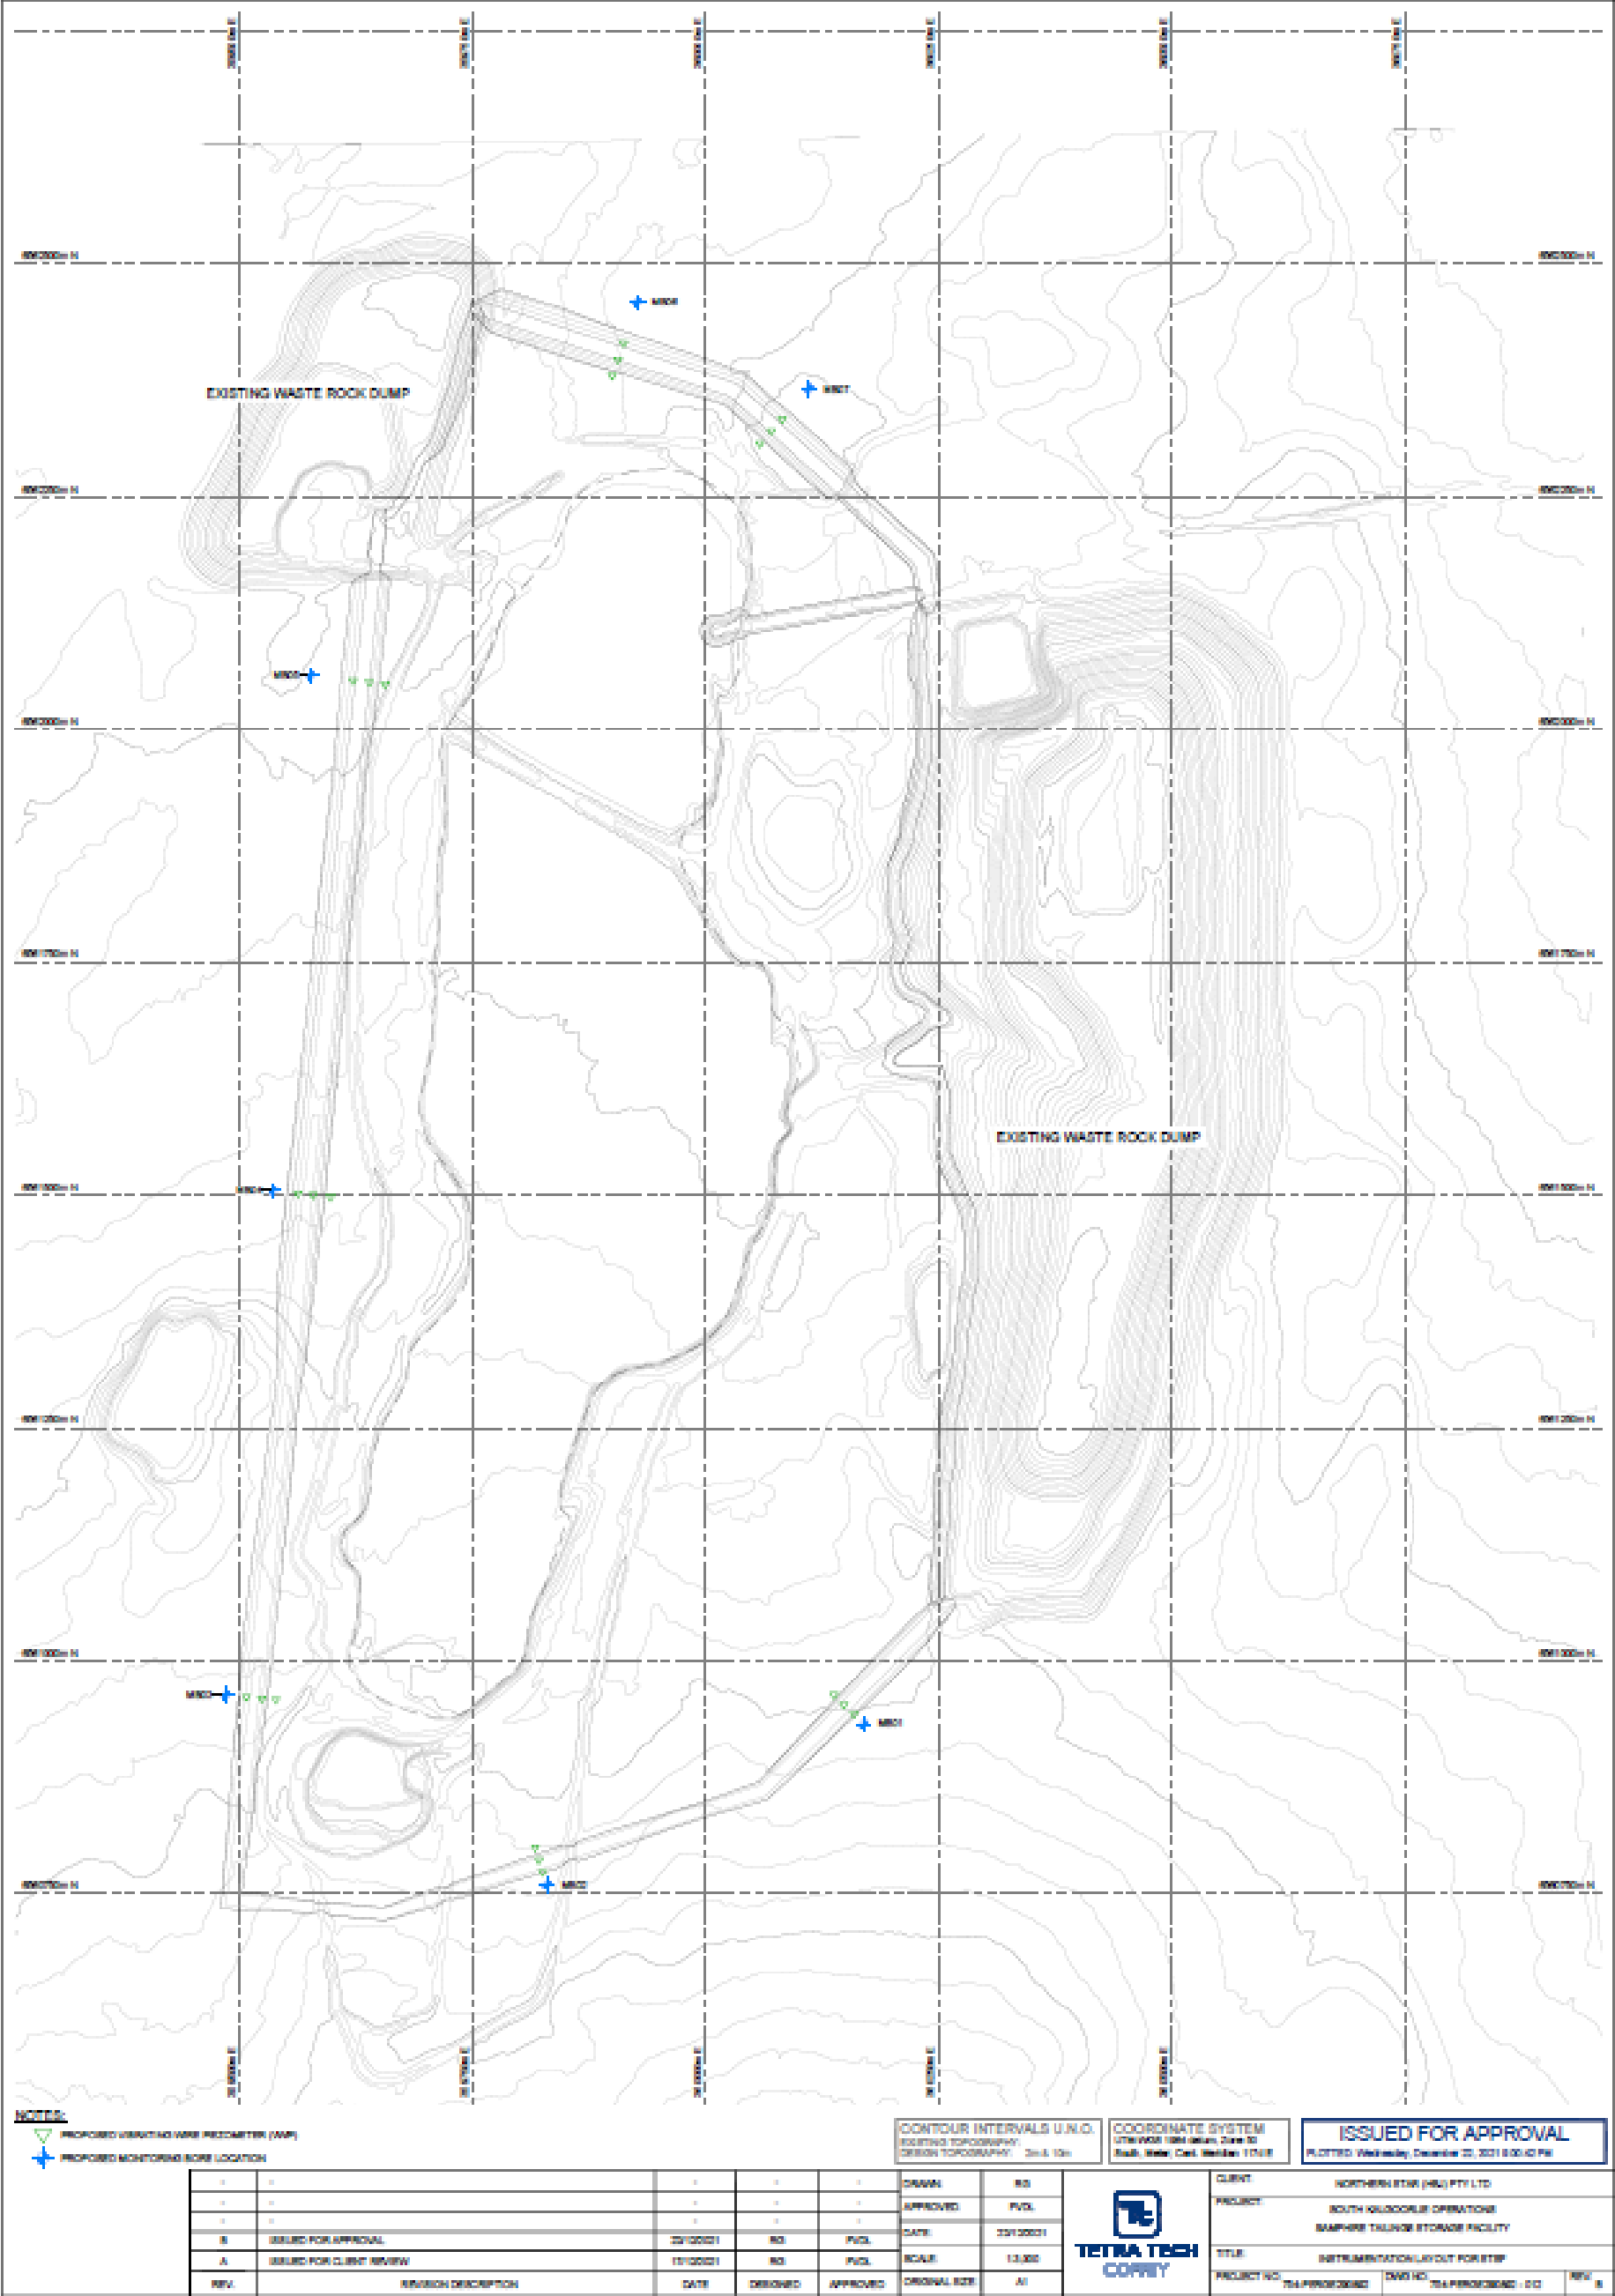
Vibrating Wire Piezometer location – Drawing number: 754-PERGE290892 - 012
